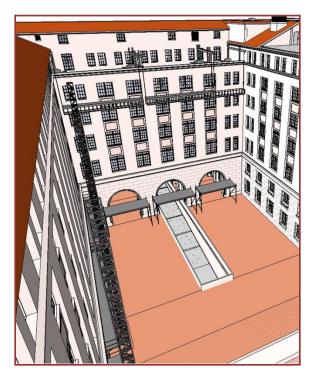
Revit image illustrating the varieties of scaffolding and overhead protection for façade cleaning and window restoration
